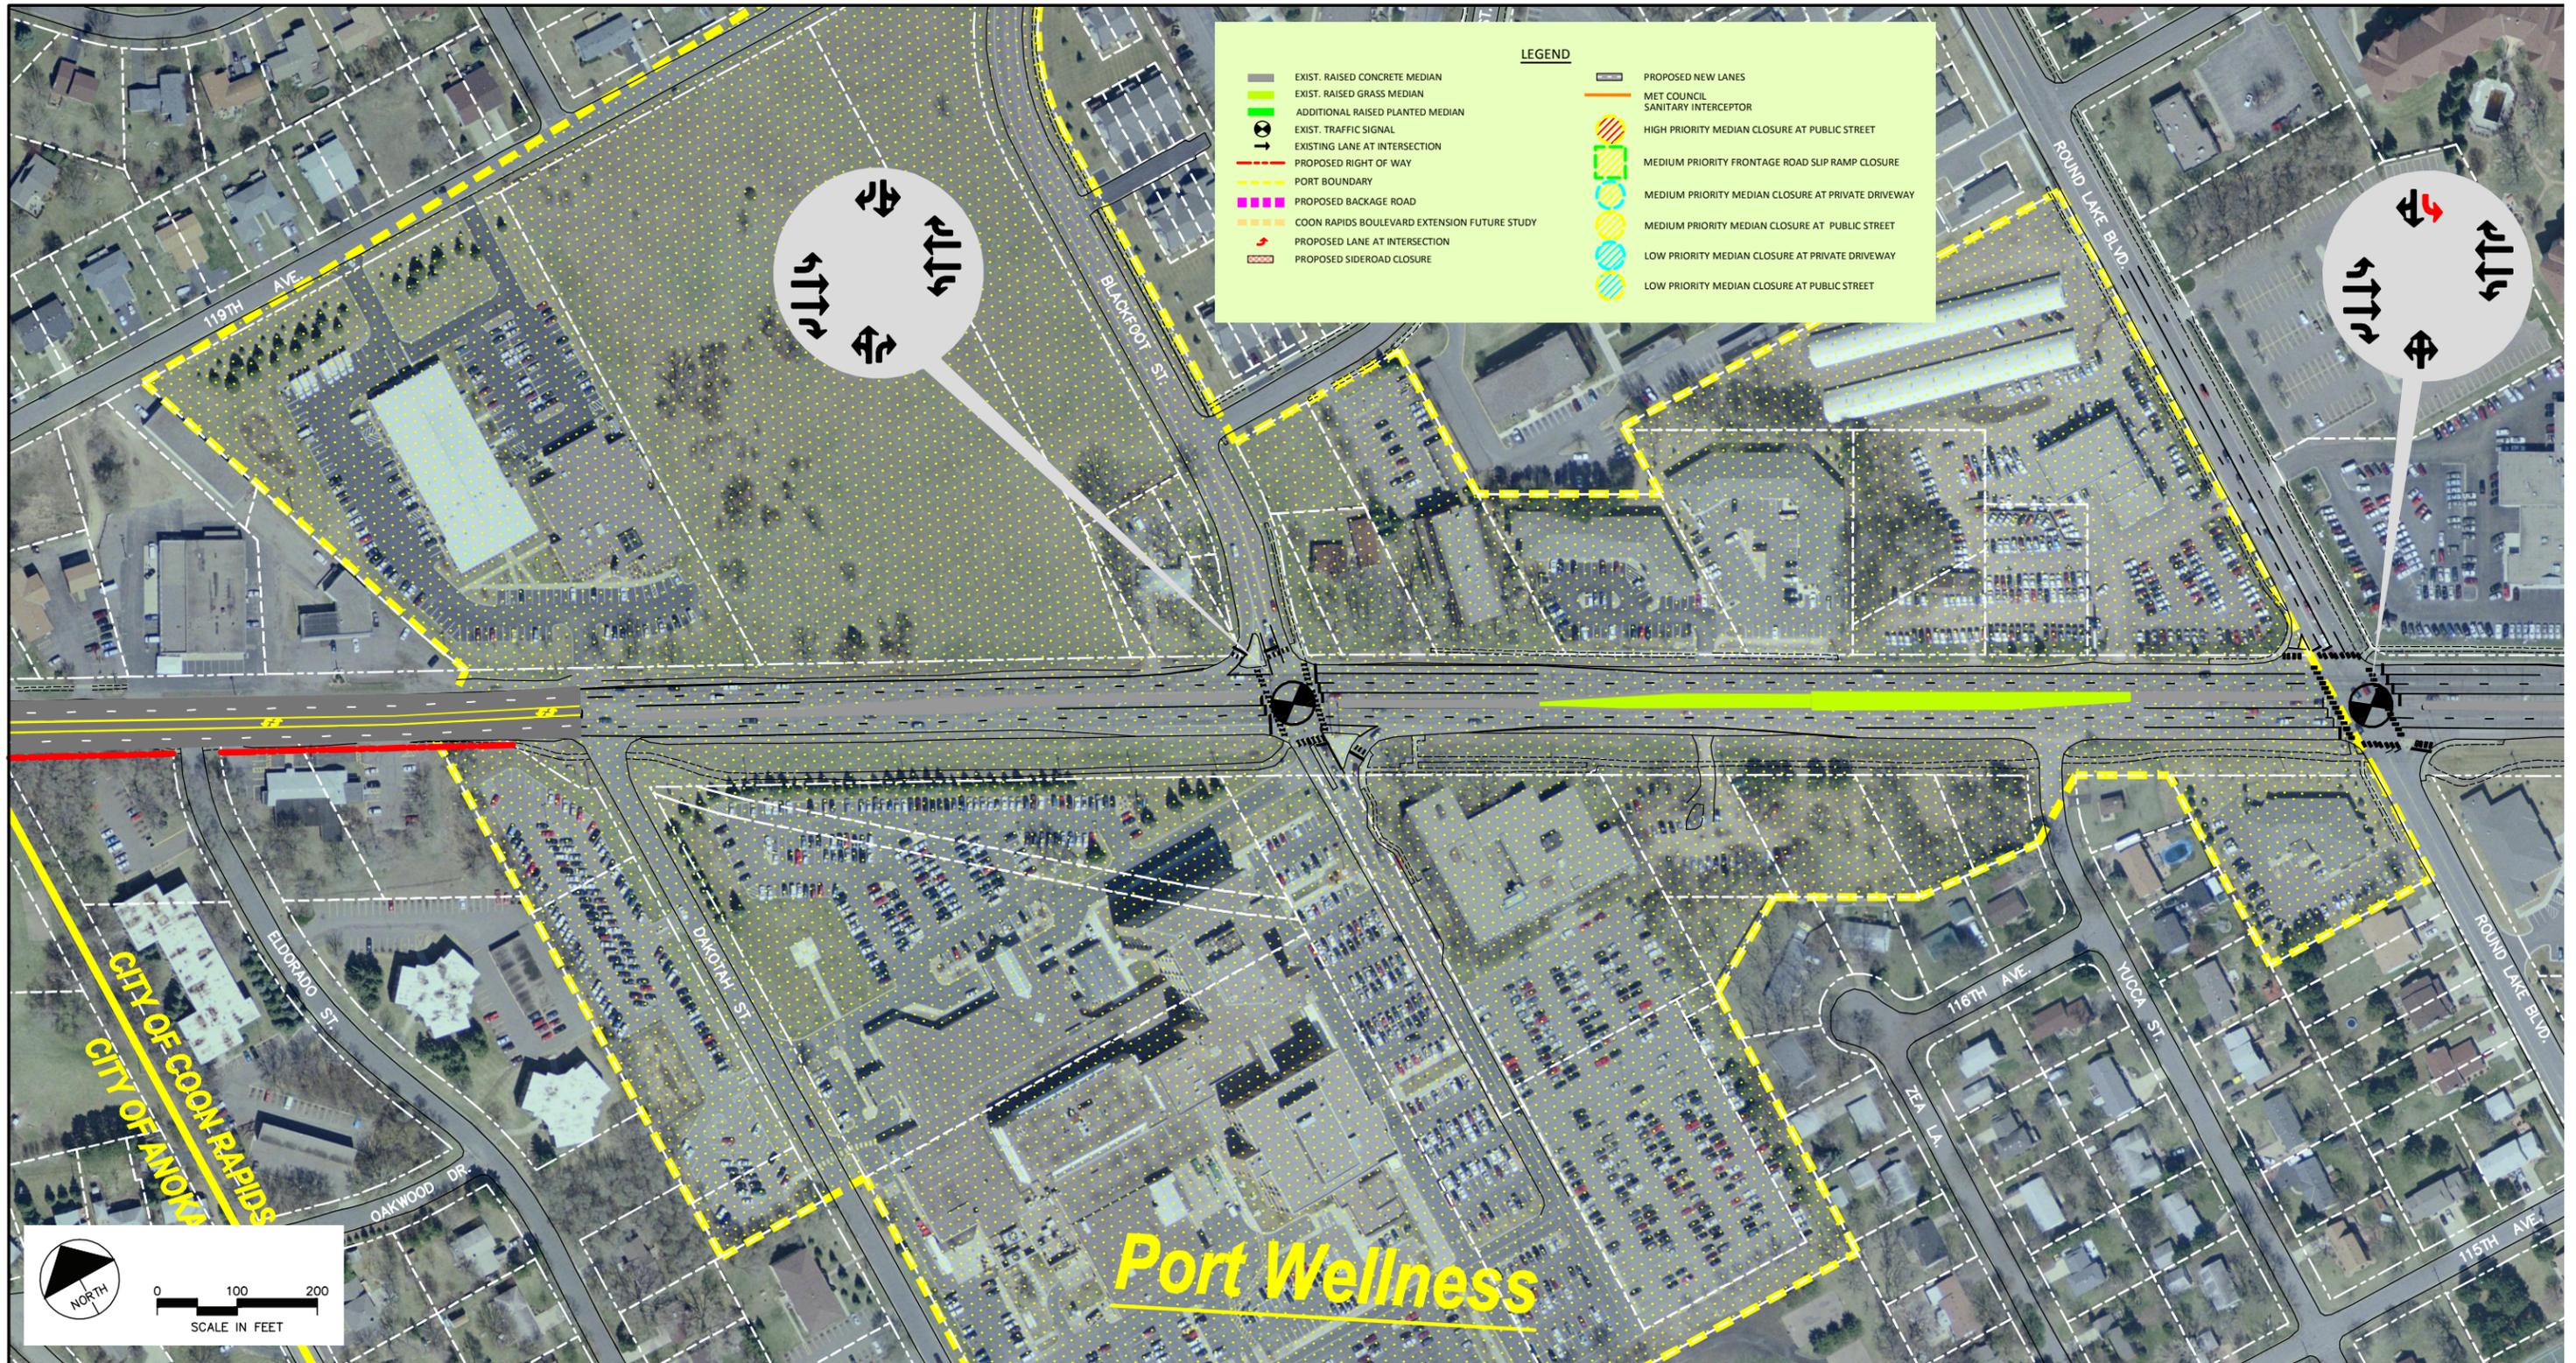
Proposed Roadway Recommendations Detail (2 of 15)
